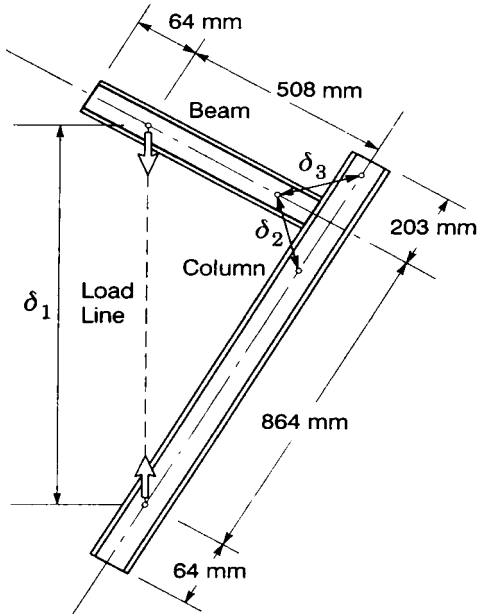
Dimensions and test setup of exterior PFRP beam-to-column connections.
